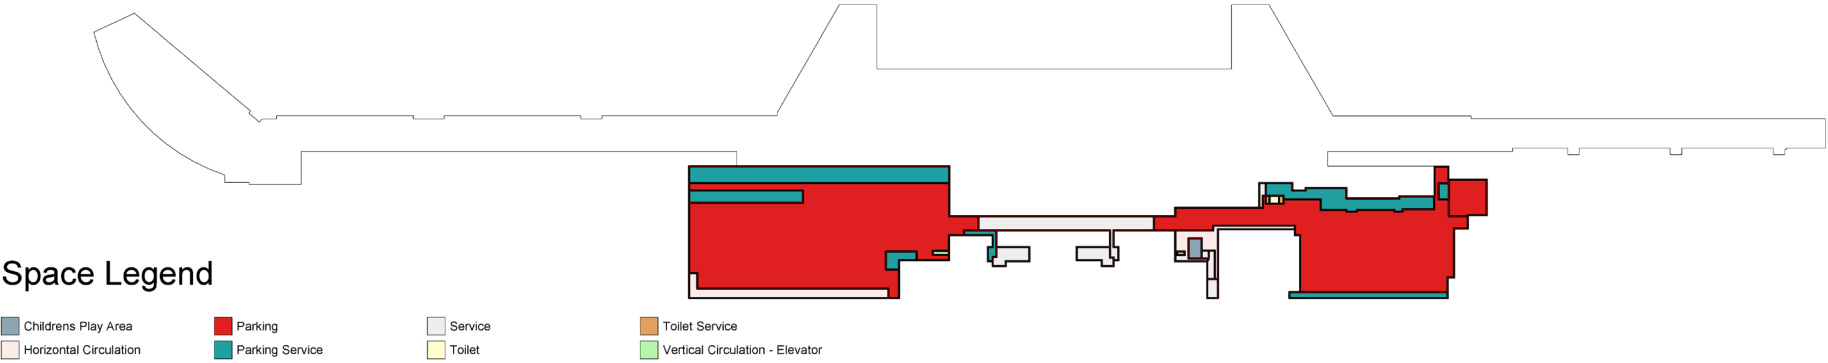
Basement Level 2 Floor Plan at Changi International Terminal 3
